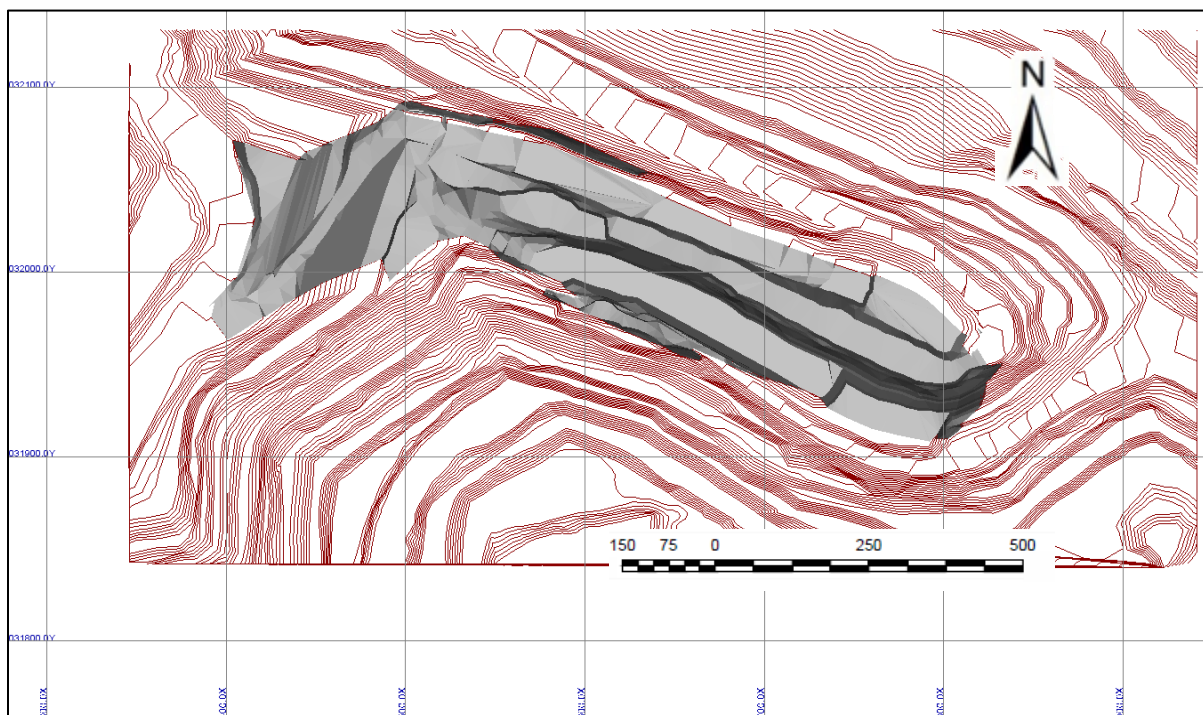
Palmarejo Open Pit Design in Plan View (Coeur, 2015)
